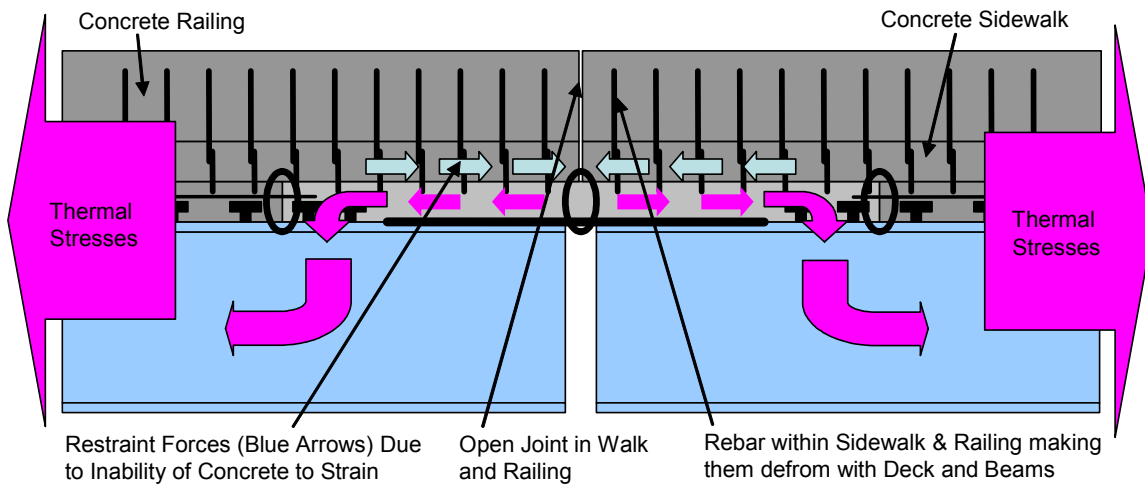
Concrete sidewalk and barrier wall deforming incompatibly with ECC link slab resulting in localization of cracking at ends of link slab or under concrete expansion joint. (Potential stress concentration locations highlighted by circling.)
